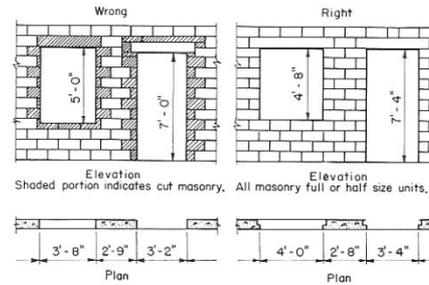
Examples of wrong and right planning of concrete masonry wall openings based on 8x8x16-in. block.
